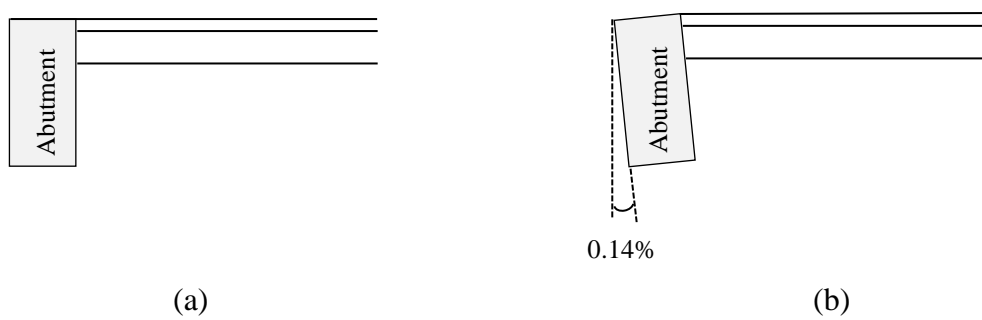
(a) Abutment neutral position before loading and (b) abutment position after 20 cycles of loading, Case 1
